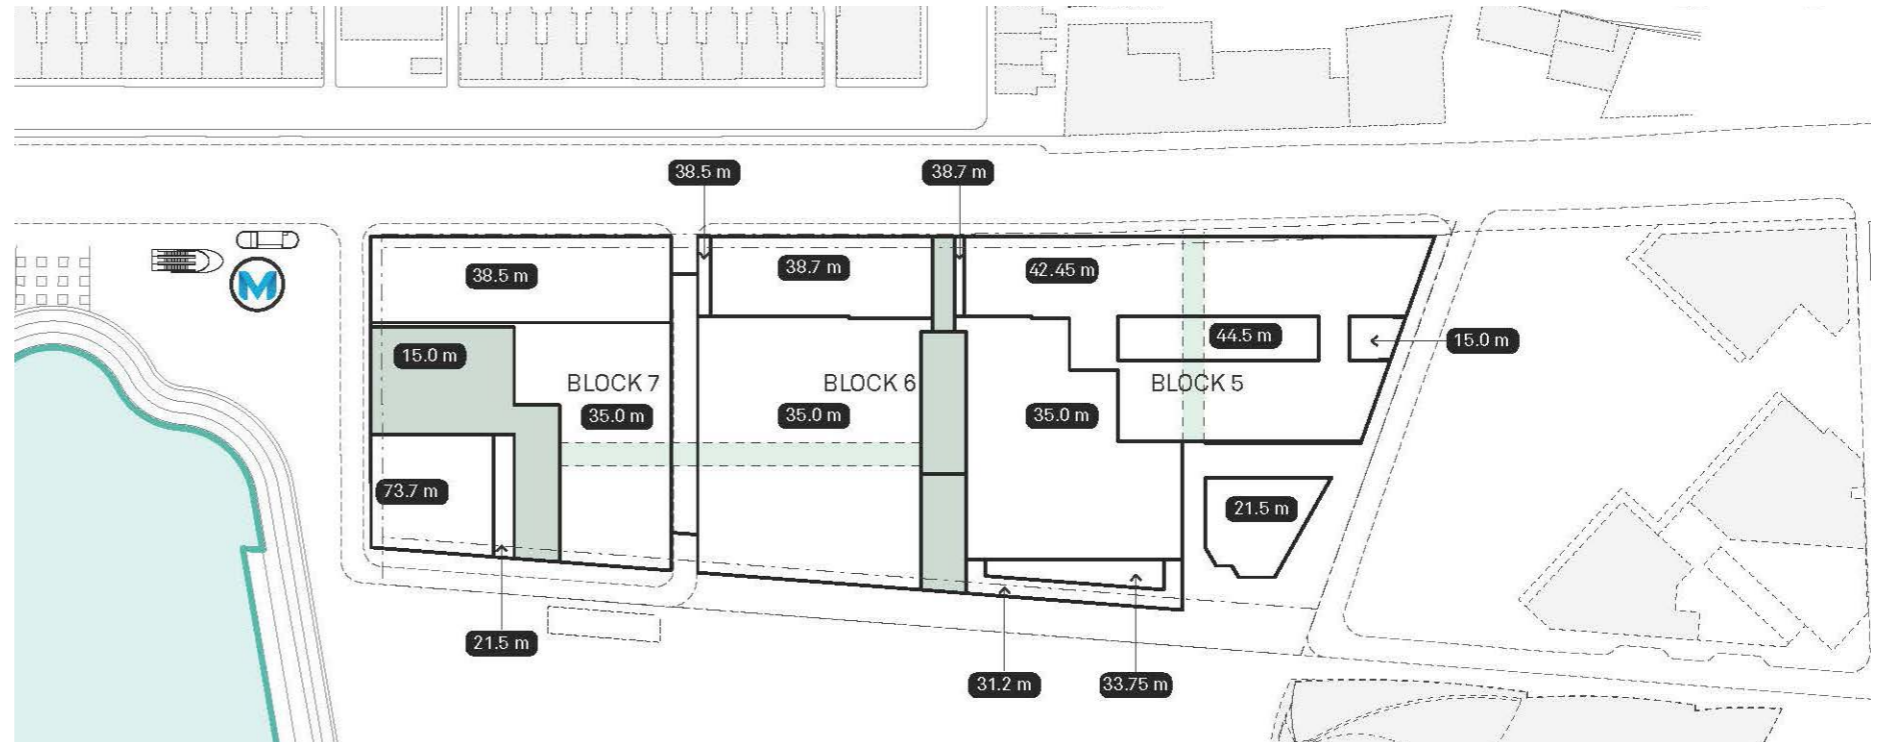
Plan diagram of MOD 9 with building heights (Source: HASSELL diagrams (November 2021))
